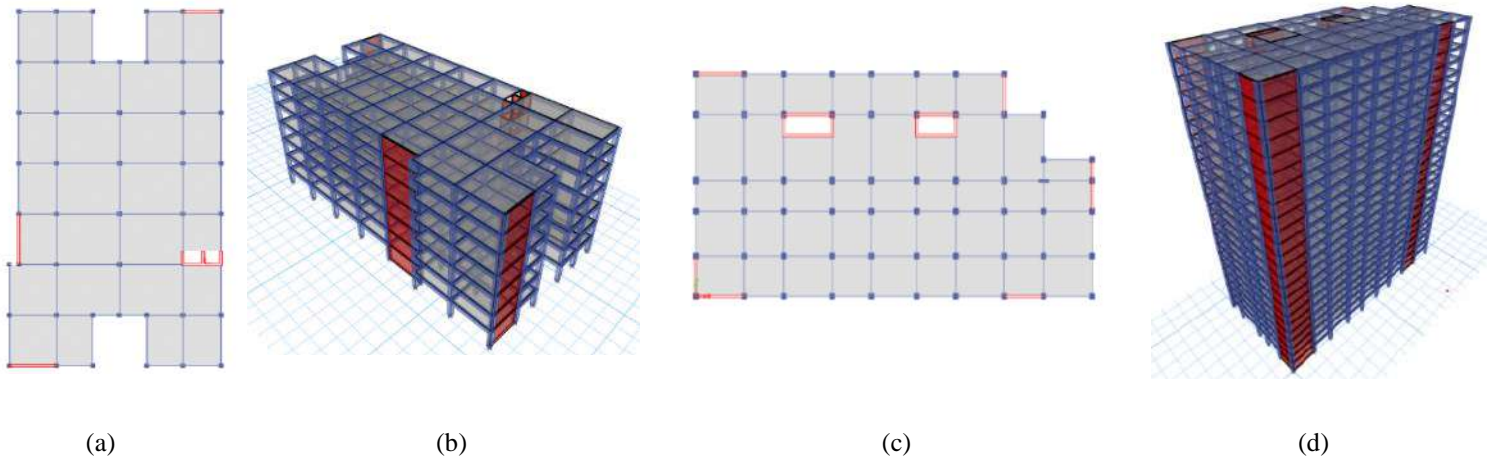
The architectural details of case study structures (a) floor plan of 7 story building (b) 3D model of 7 story building (c) floor plan of 24 story building (d) 3D model of 24 story building.
